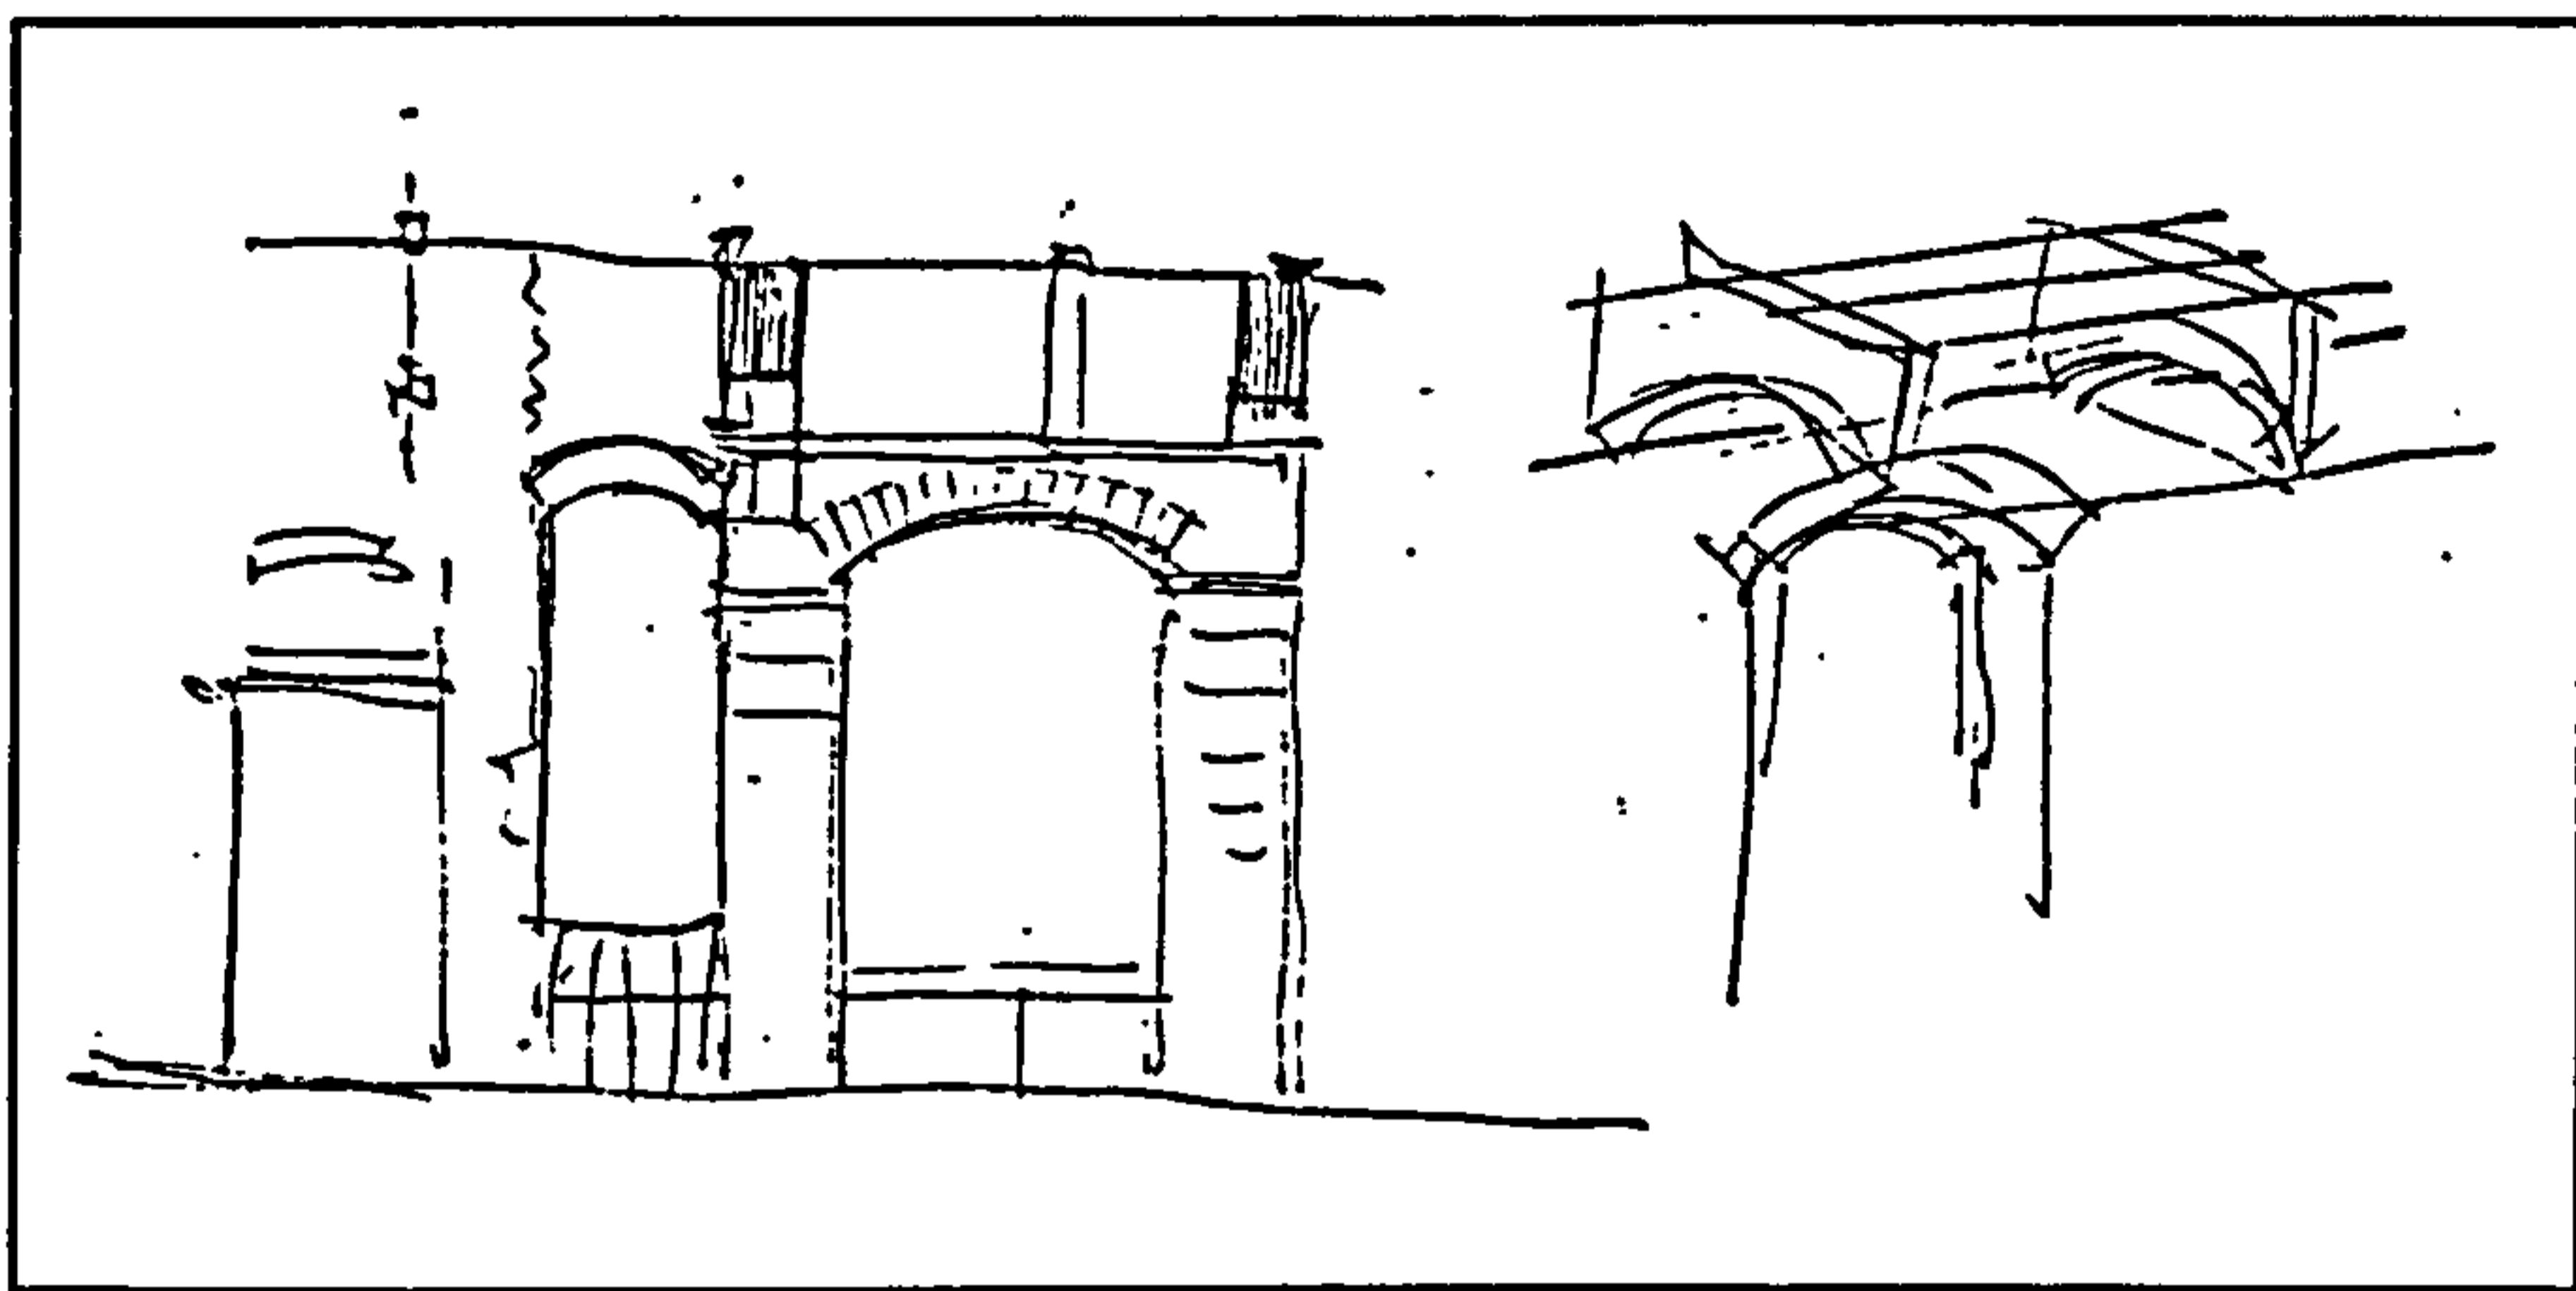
Sketch proposal for a roof above the Bathroom. Fyfe, Notebook 1902
